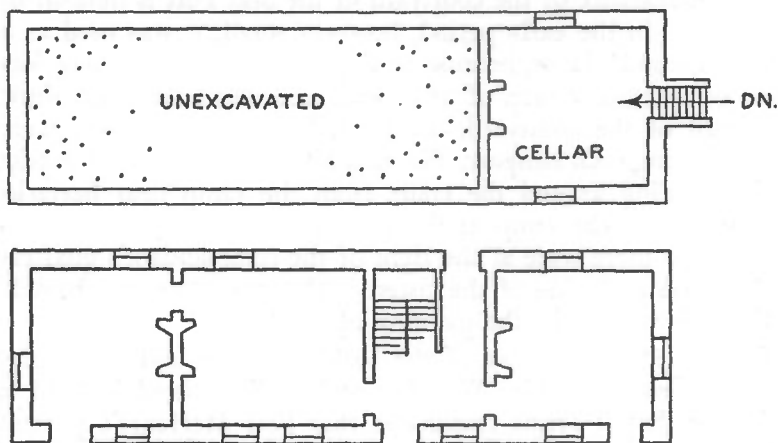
Building C, Officers Quarters, cellar and main floor plans, 1834.
